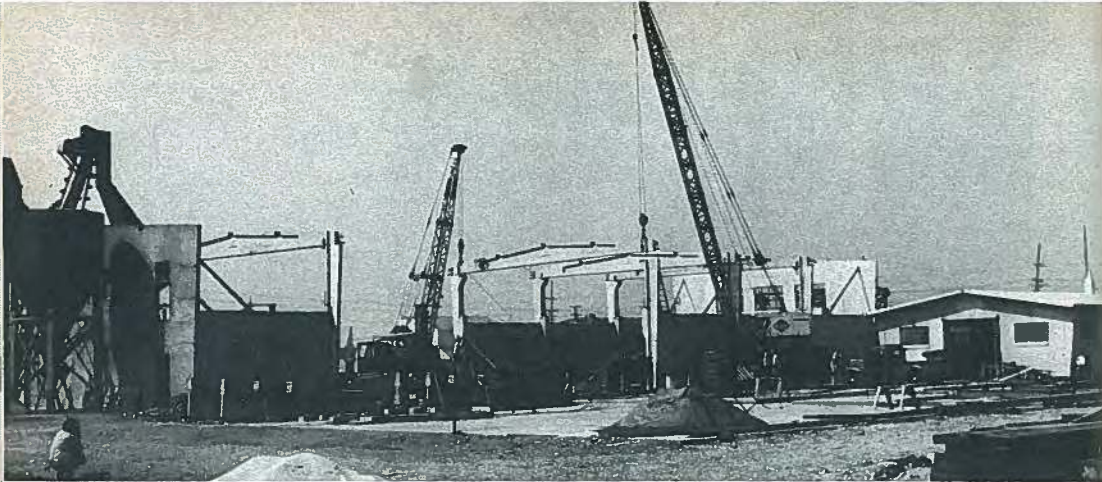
General view of erection operations of plant for Concrete Engineering Co.
